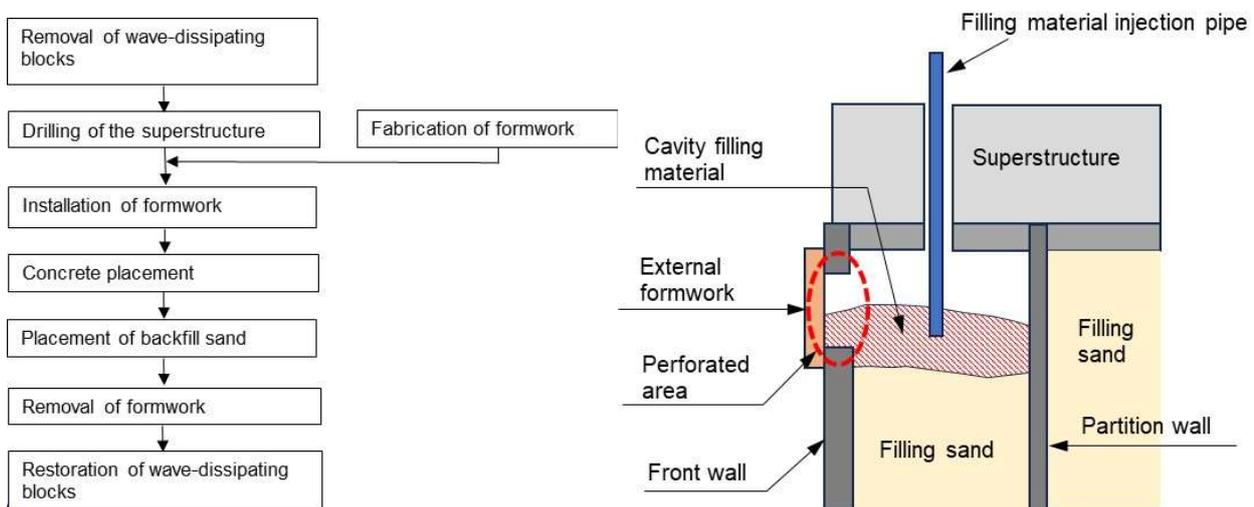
Construction Procedure and Schematic Diagram of the External Formwork Method ²⁾
